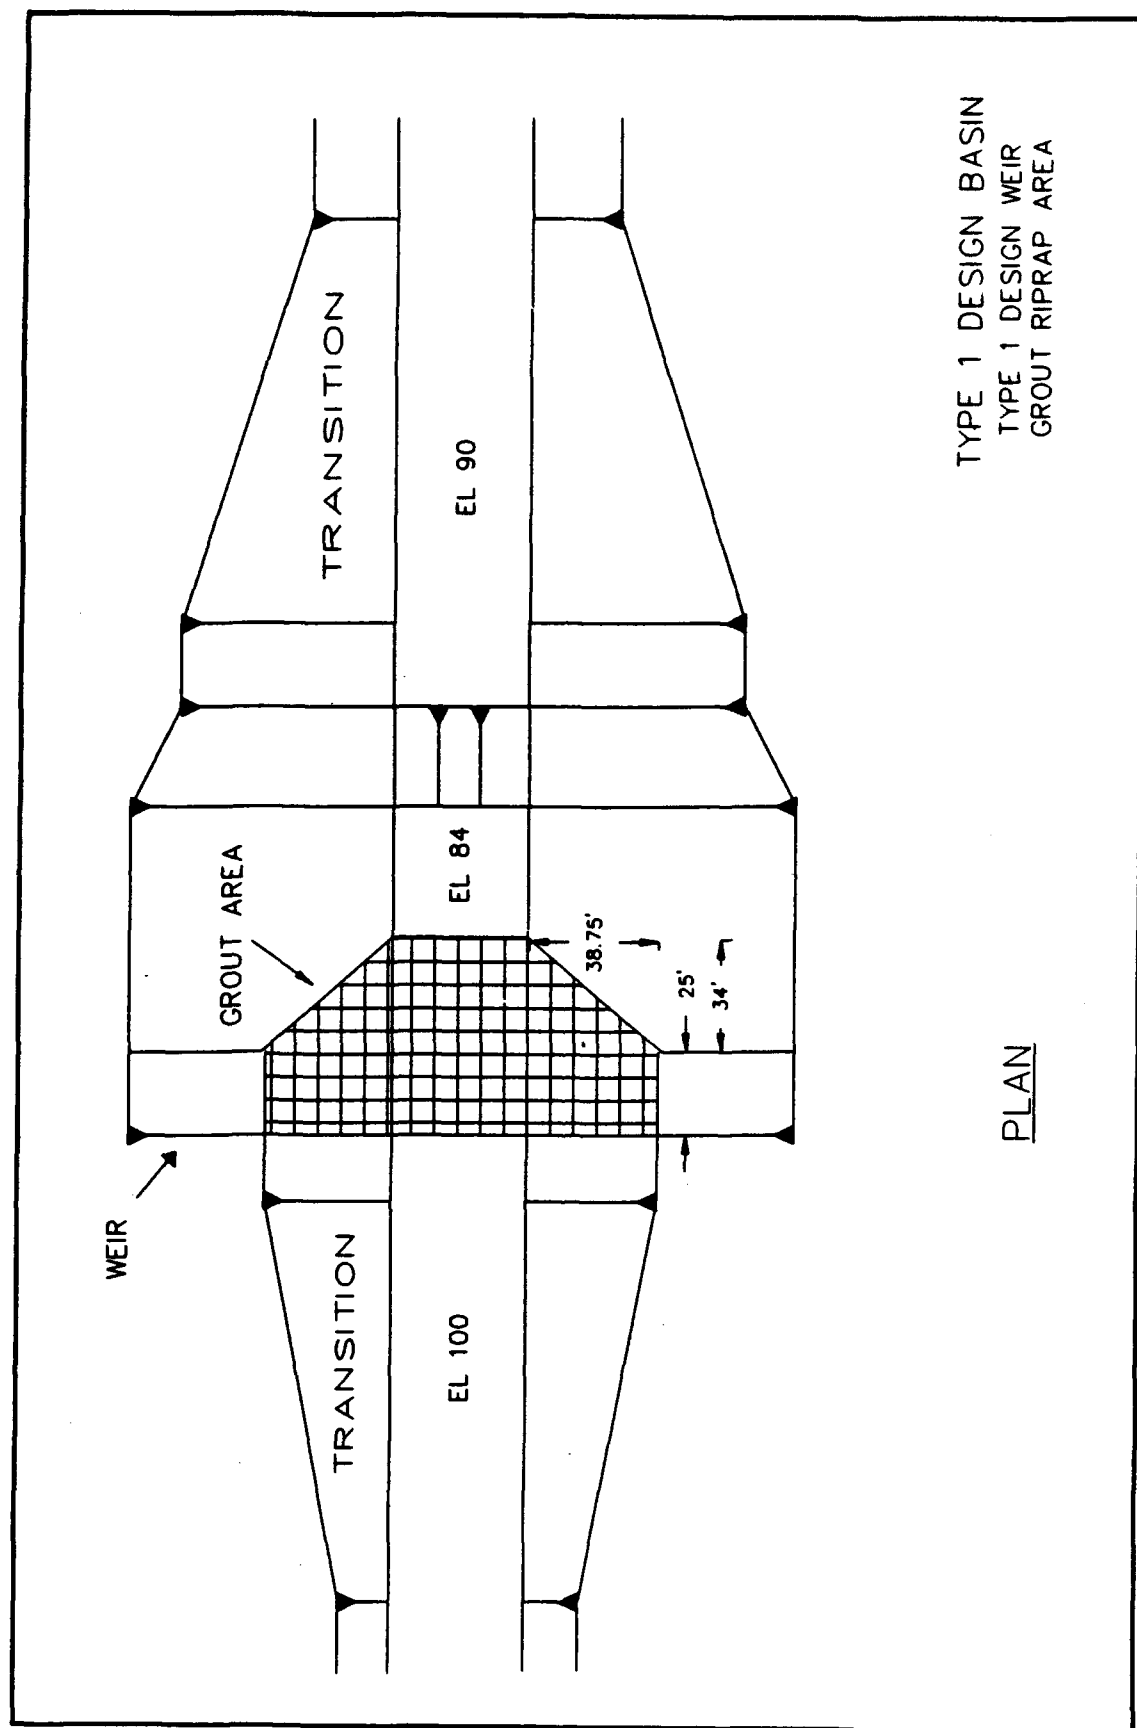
Plan view, Type 1 weir, grouted area in stilling basin
